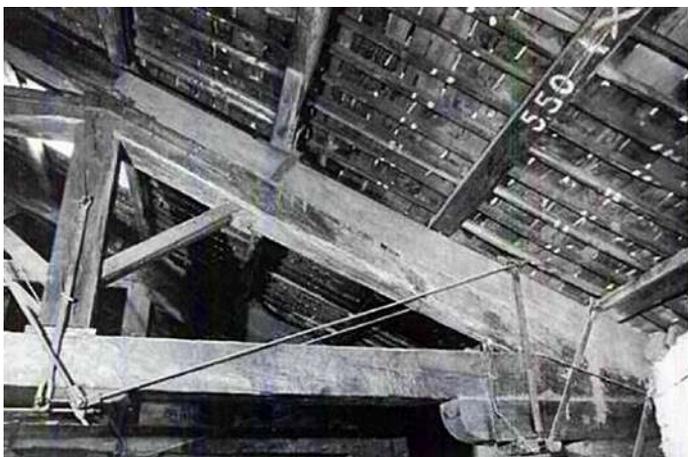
Reinforcement of a truss tie-beam. Detail and design schemes of the Savona Theatre project. (Image source: courtesy of the designer, ing. L. Paolini).
